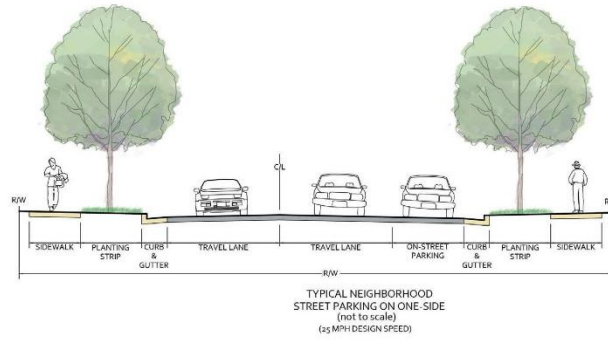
NEIGHBORHOOD STREET CROSS SECTION
